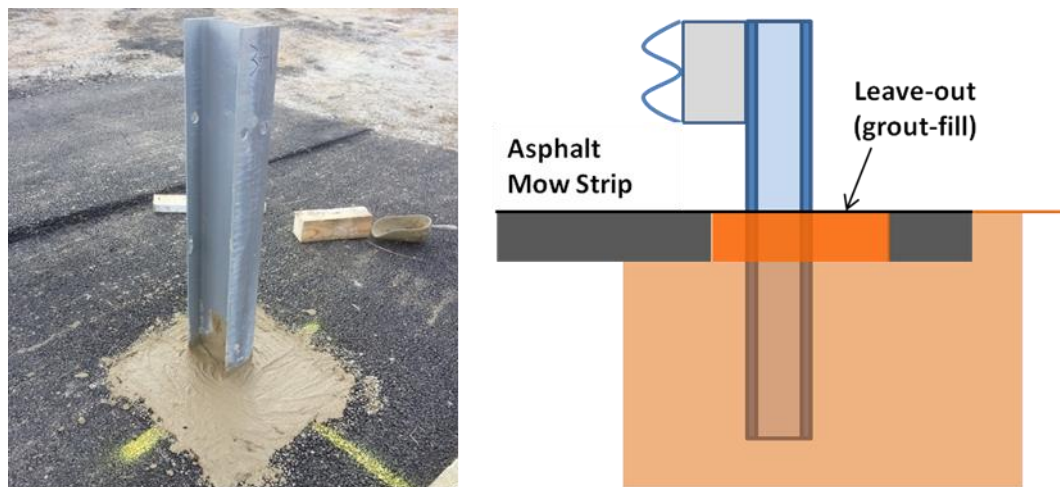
Typical post installation detail with asphalt mow strip
